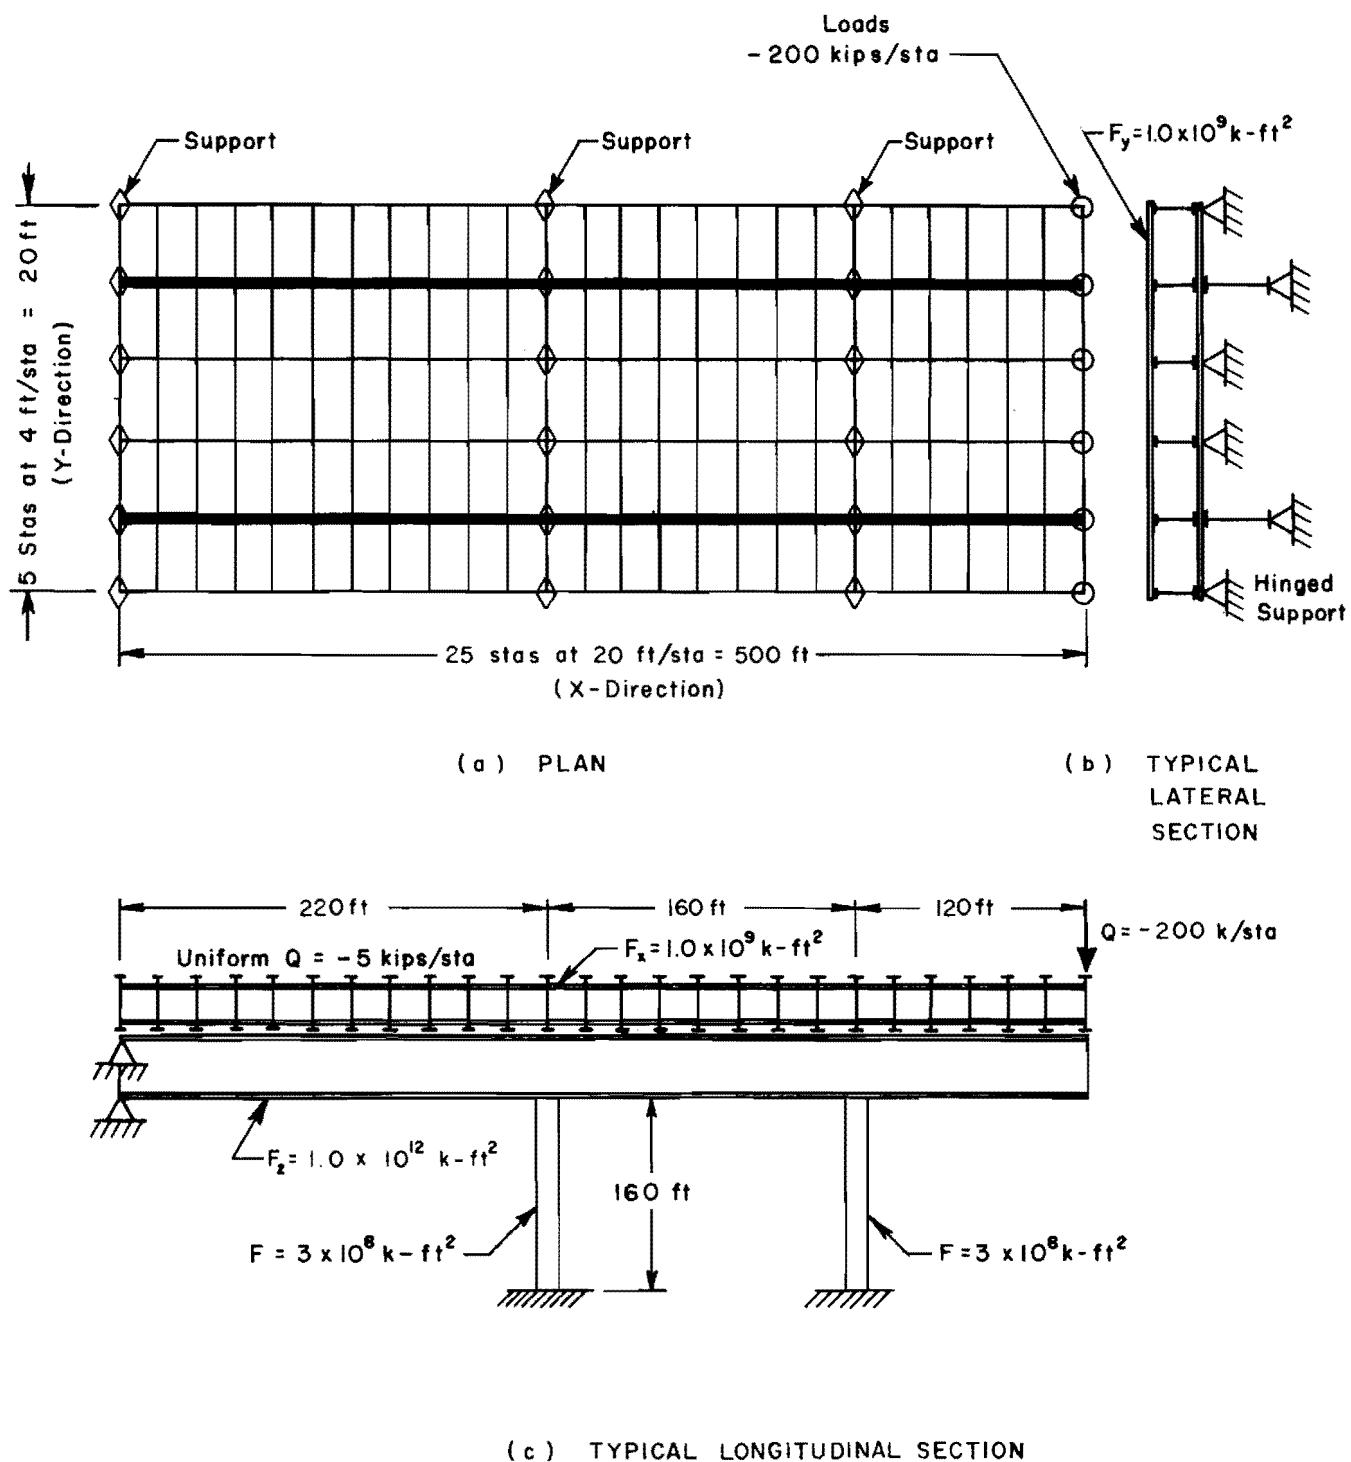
Example Problem 6.4. Substructure of large cantilever-type bridge.
